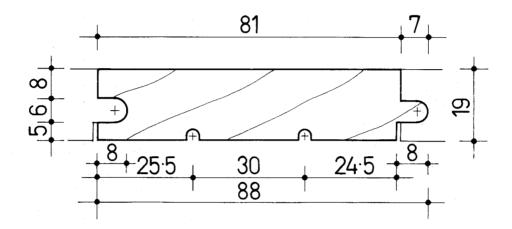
100 mm x 25 mm TONGUE AND GROOVE FLOORING (full size)
